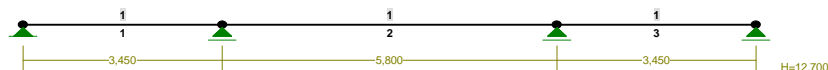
Computational diagram for floor slabs over the basement and the ground floor
